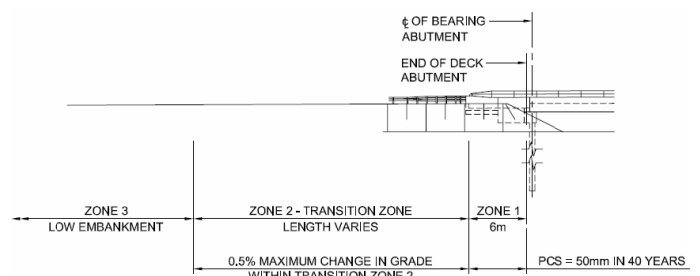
Zones of approach embankment close to bridge culvert and other structures (Hsi and Martin, 2005)
